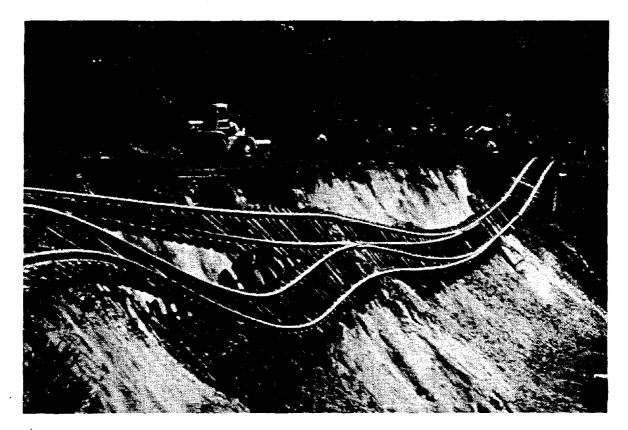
Slope failure along Union Pacific railroad right-of-way in 1949 Olympia, Washington earthquake (photo by G.W. Thorsen)
